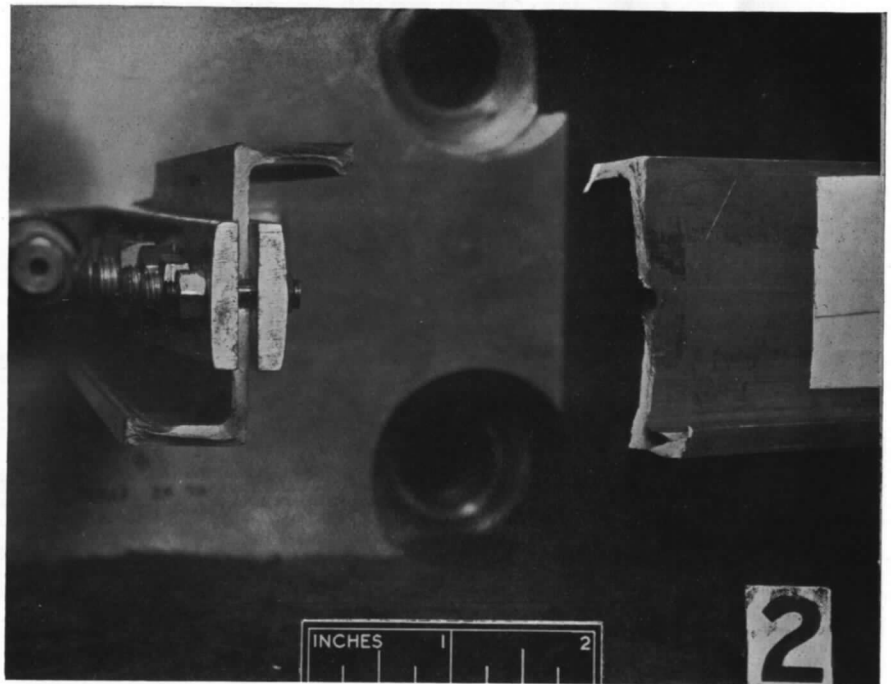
Nuts slackened. Crack starting at bolt hole.
